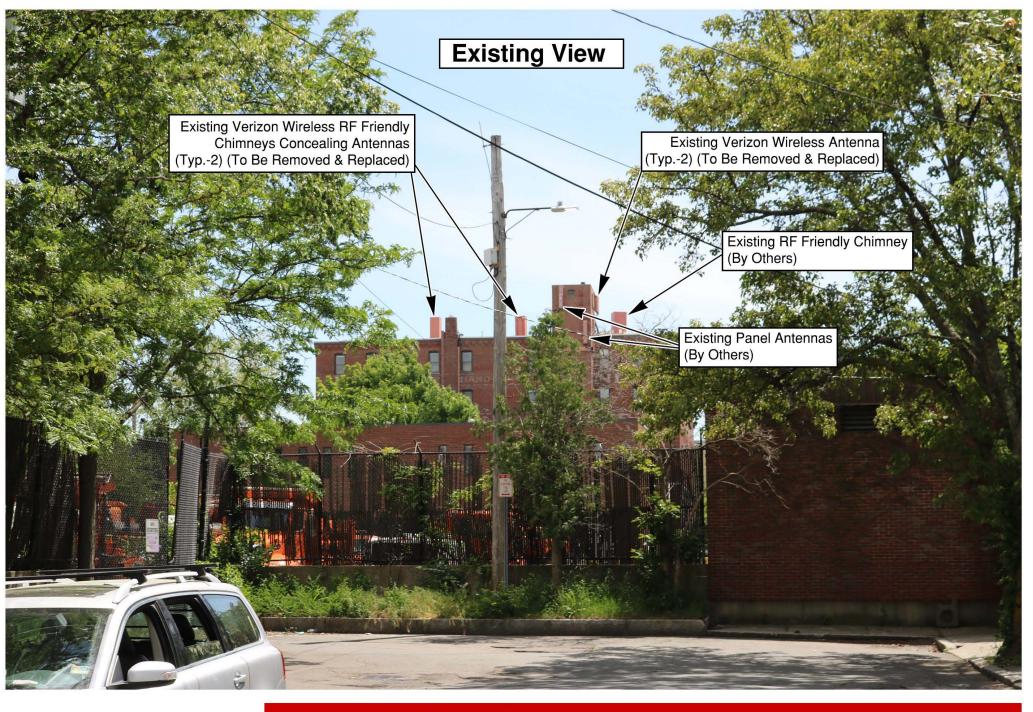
A View Facing South From Norfolk Street (Page 7 of 9)
